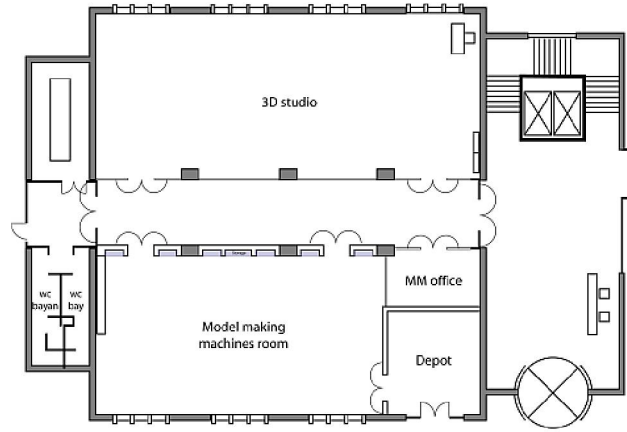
Architectural plan of the model making facilities in IUE FFAD (not to scale)
